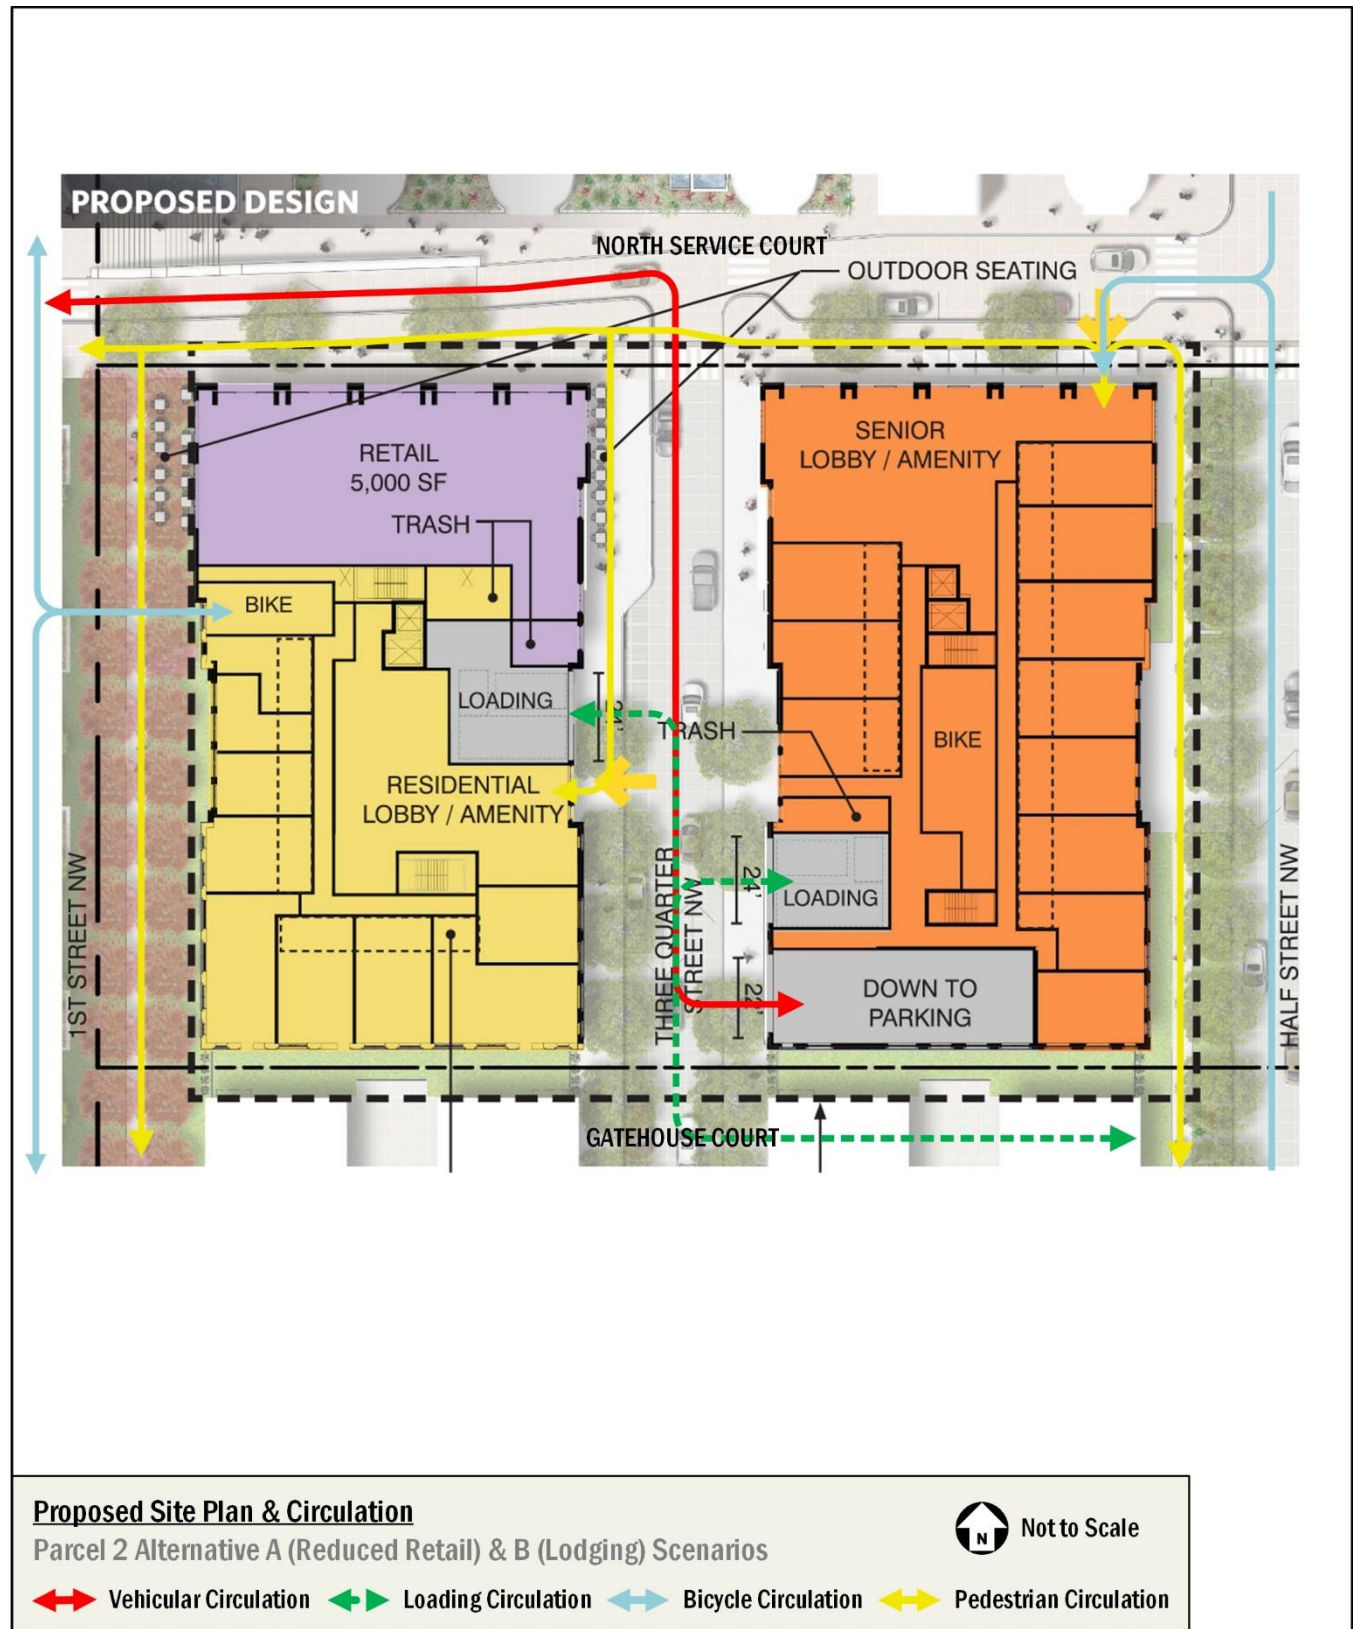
Proposed Site Plan & Circulation – Parcel 2 Alternative A & B Scenarios
